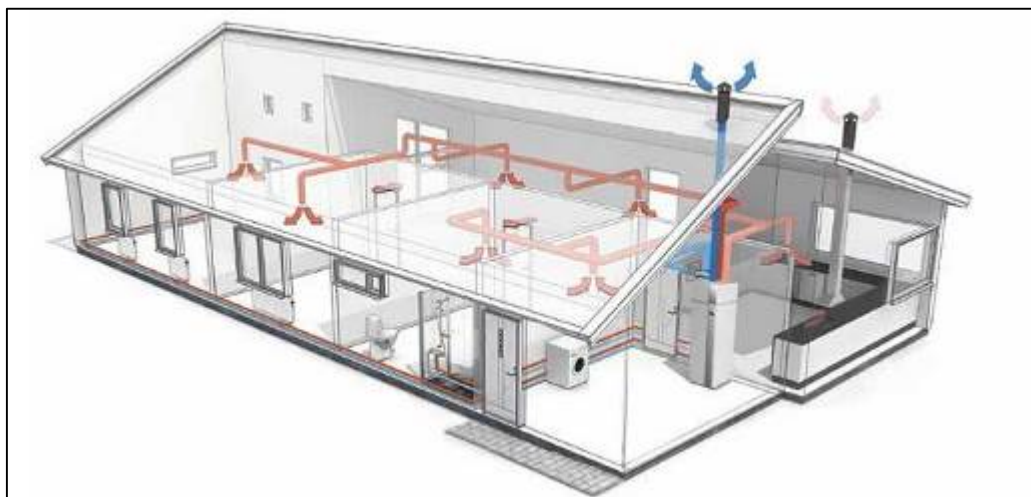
Example Diagram of Typical Exhaust Air Heat Pump Layout
